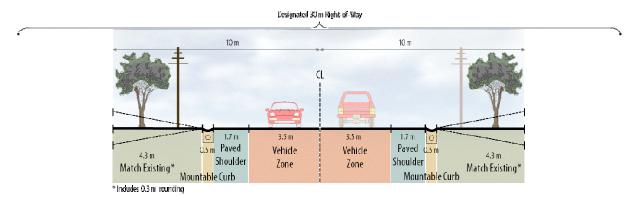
11.4 m Platform Semi-Rural Cross-Section for Olde Base Line Road
